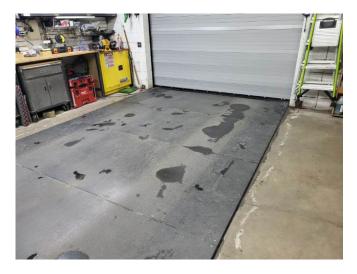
Zamboni Slab on Grade Covered with Rubber Panels (Small)
